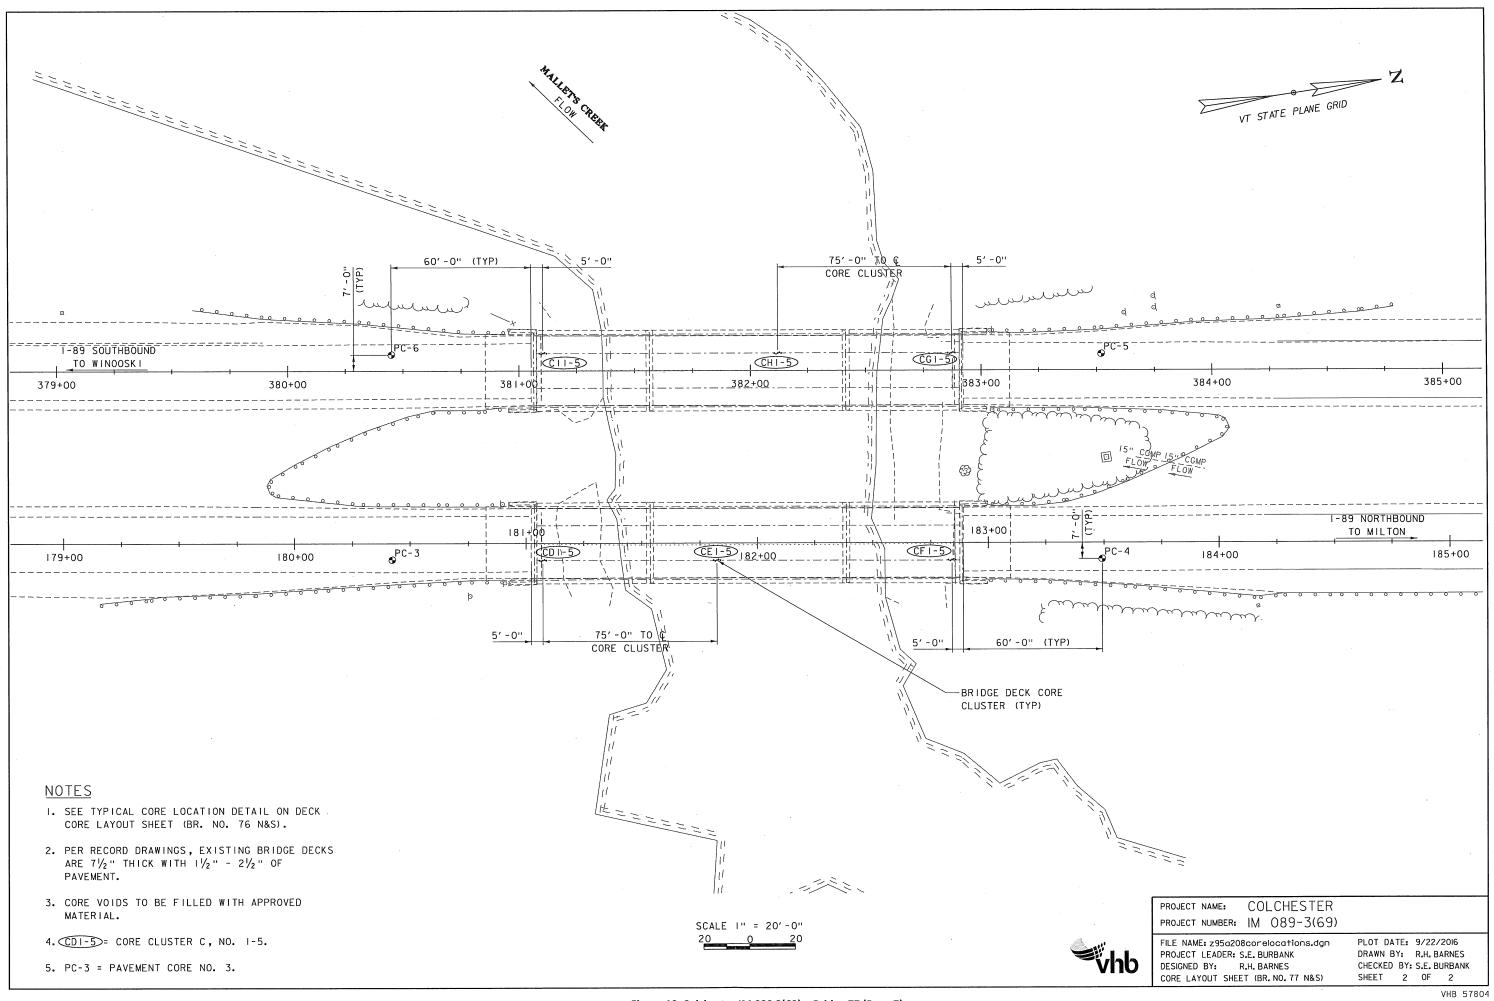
Colchester IM 089 3(69) - Bridge Element Details (Page 6)
